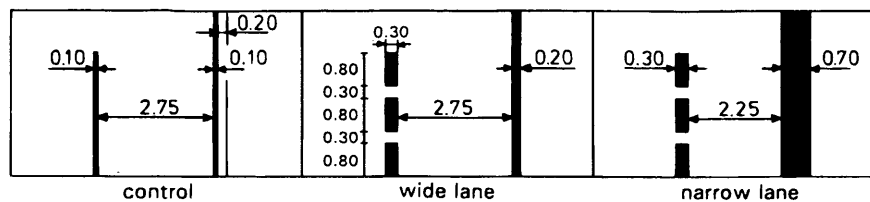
Cross section of control road (lane width 2.75 m) and experimental roads with wide (width 2.75 m) and narrow (width 2.25 m) lanes.
